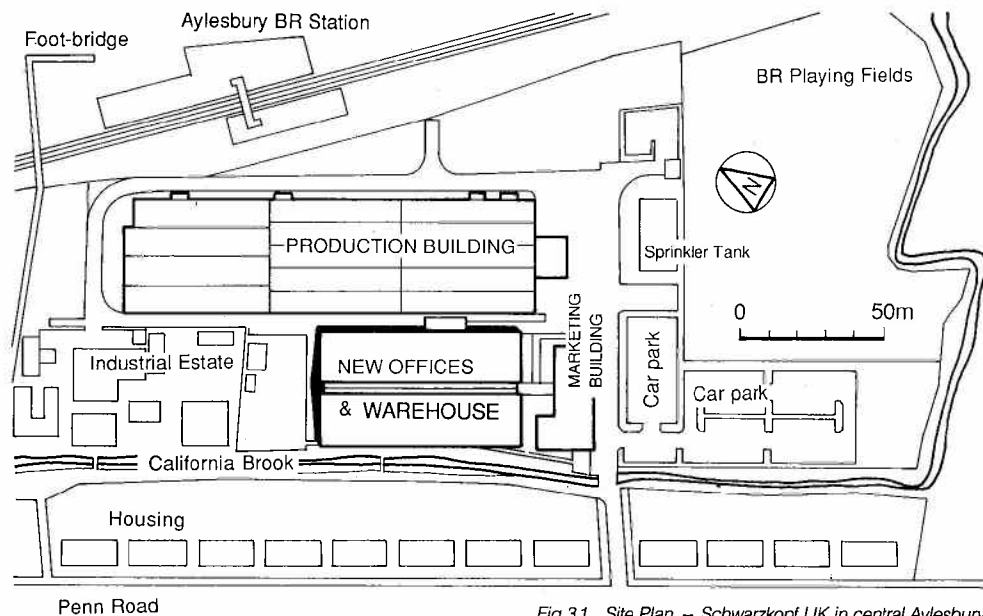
Site Plan - Schwarzkopf UK in central Aylesbury
